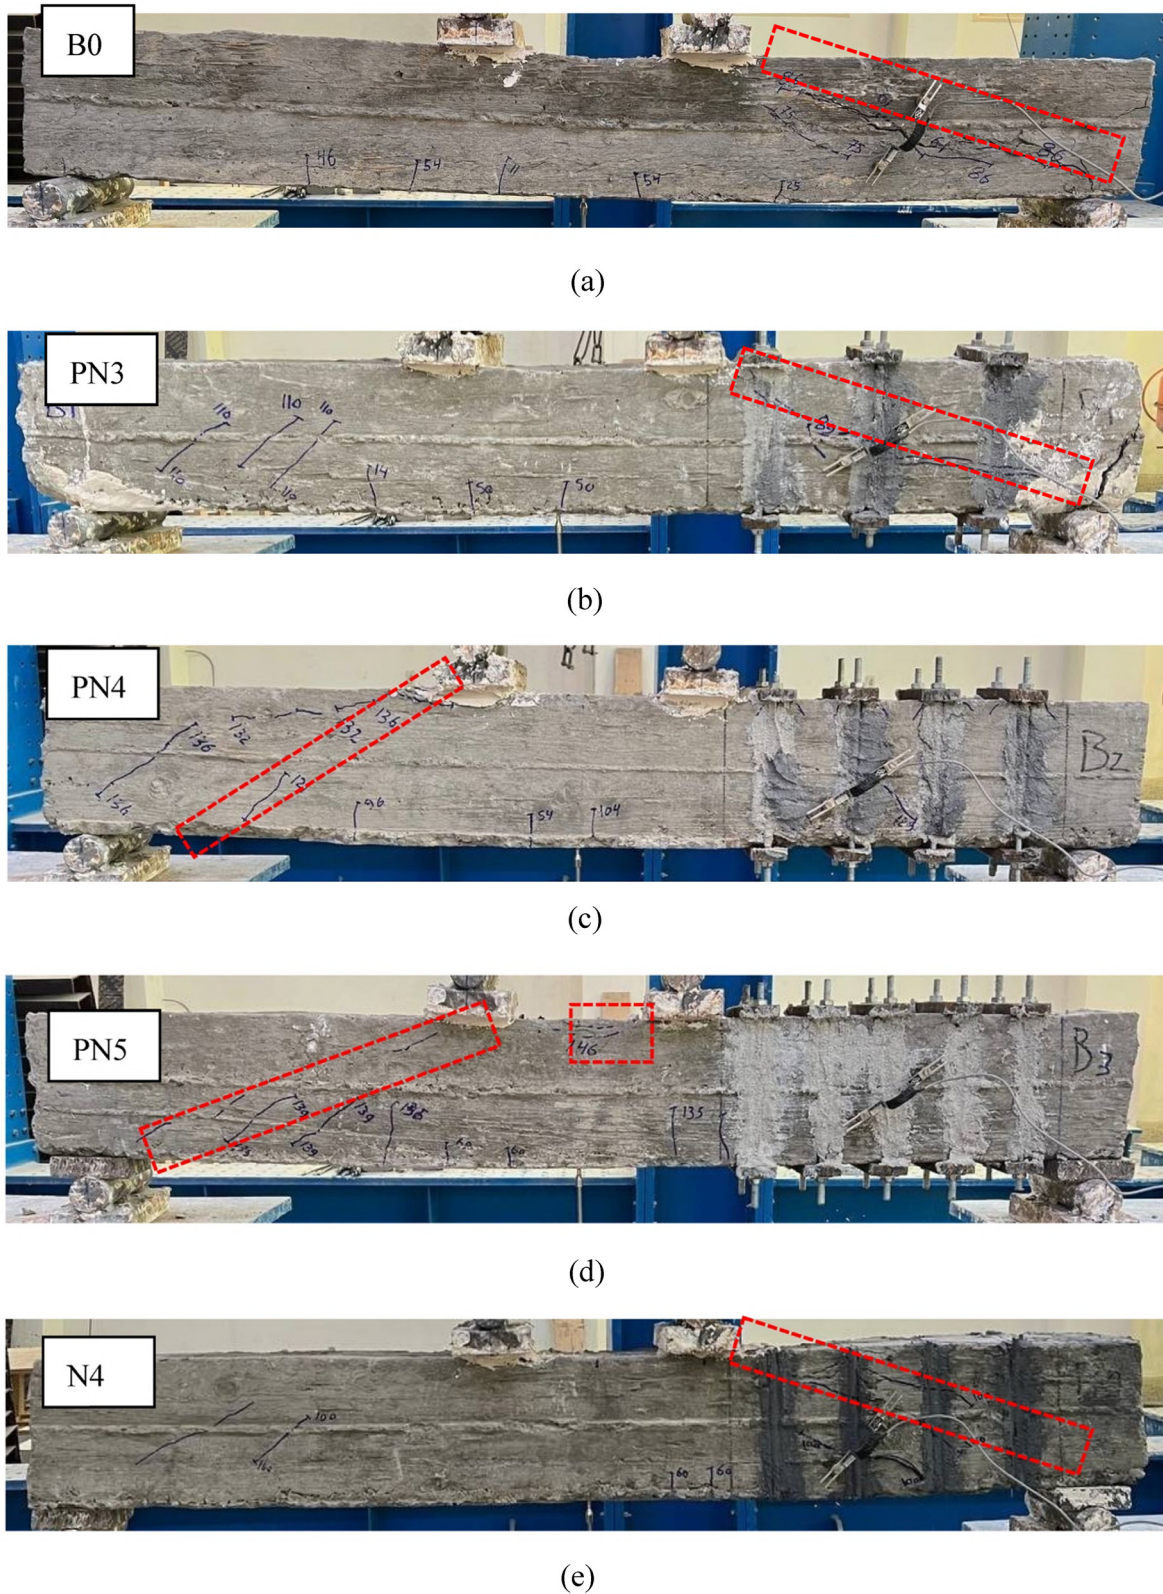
Shear failure of beam under different conditions [19]. (a) Unstrengthened beam (B0). (b) Externally strengthened beam with three prestressing pair tendons (PN3). (c) Externally strengthened beam with four prestressing pair tendons (PN4). (d) Externally strengthened beam with five prestressing pair tendons (PN5). (e) NSM rods without prestressing.
